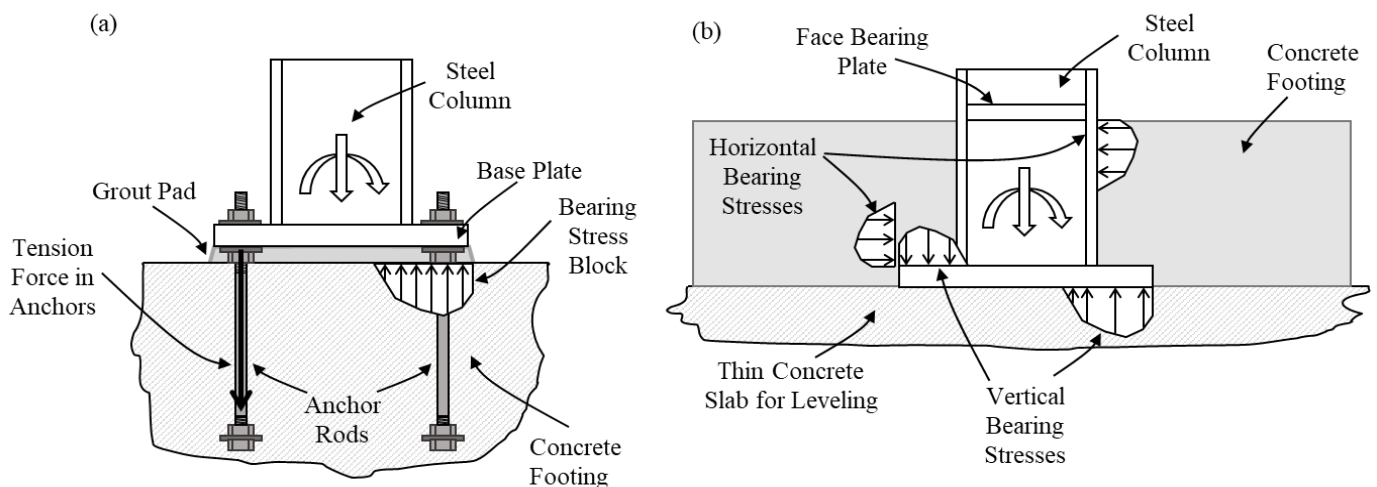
Column base connections and force transfer mechanisms: (a) exposed type; (b) embedded type (ECB Connection)
